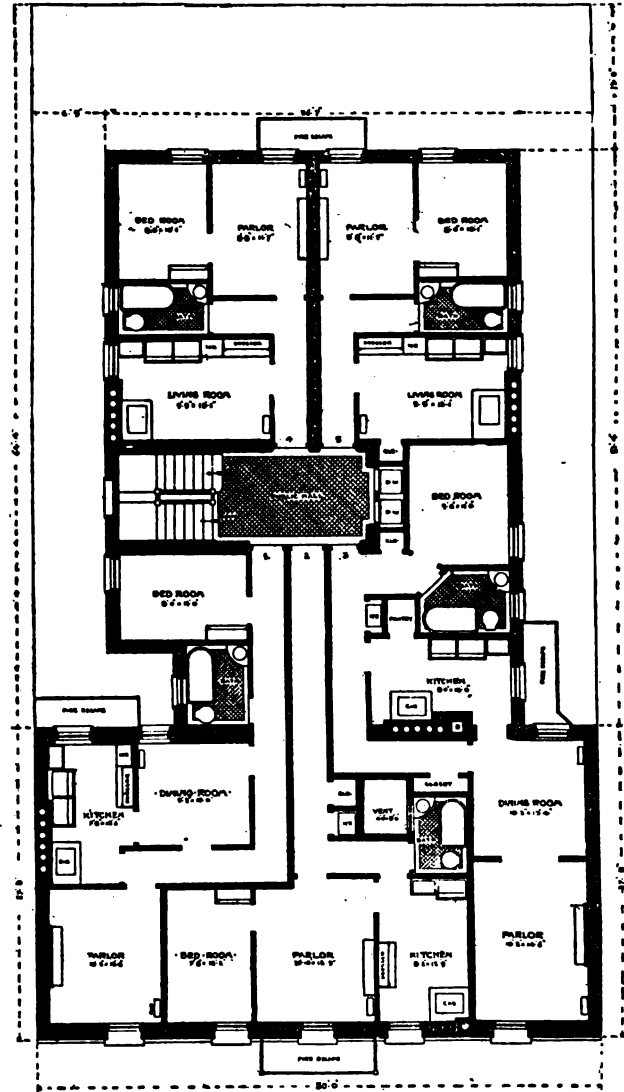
PLAN OF NEW-LAW TENEMENT-HOUSE IN NEW YORK.
